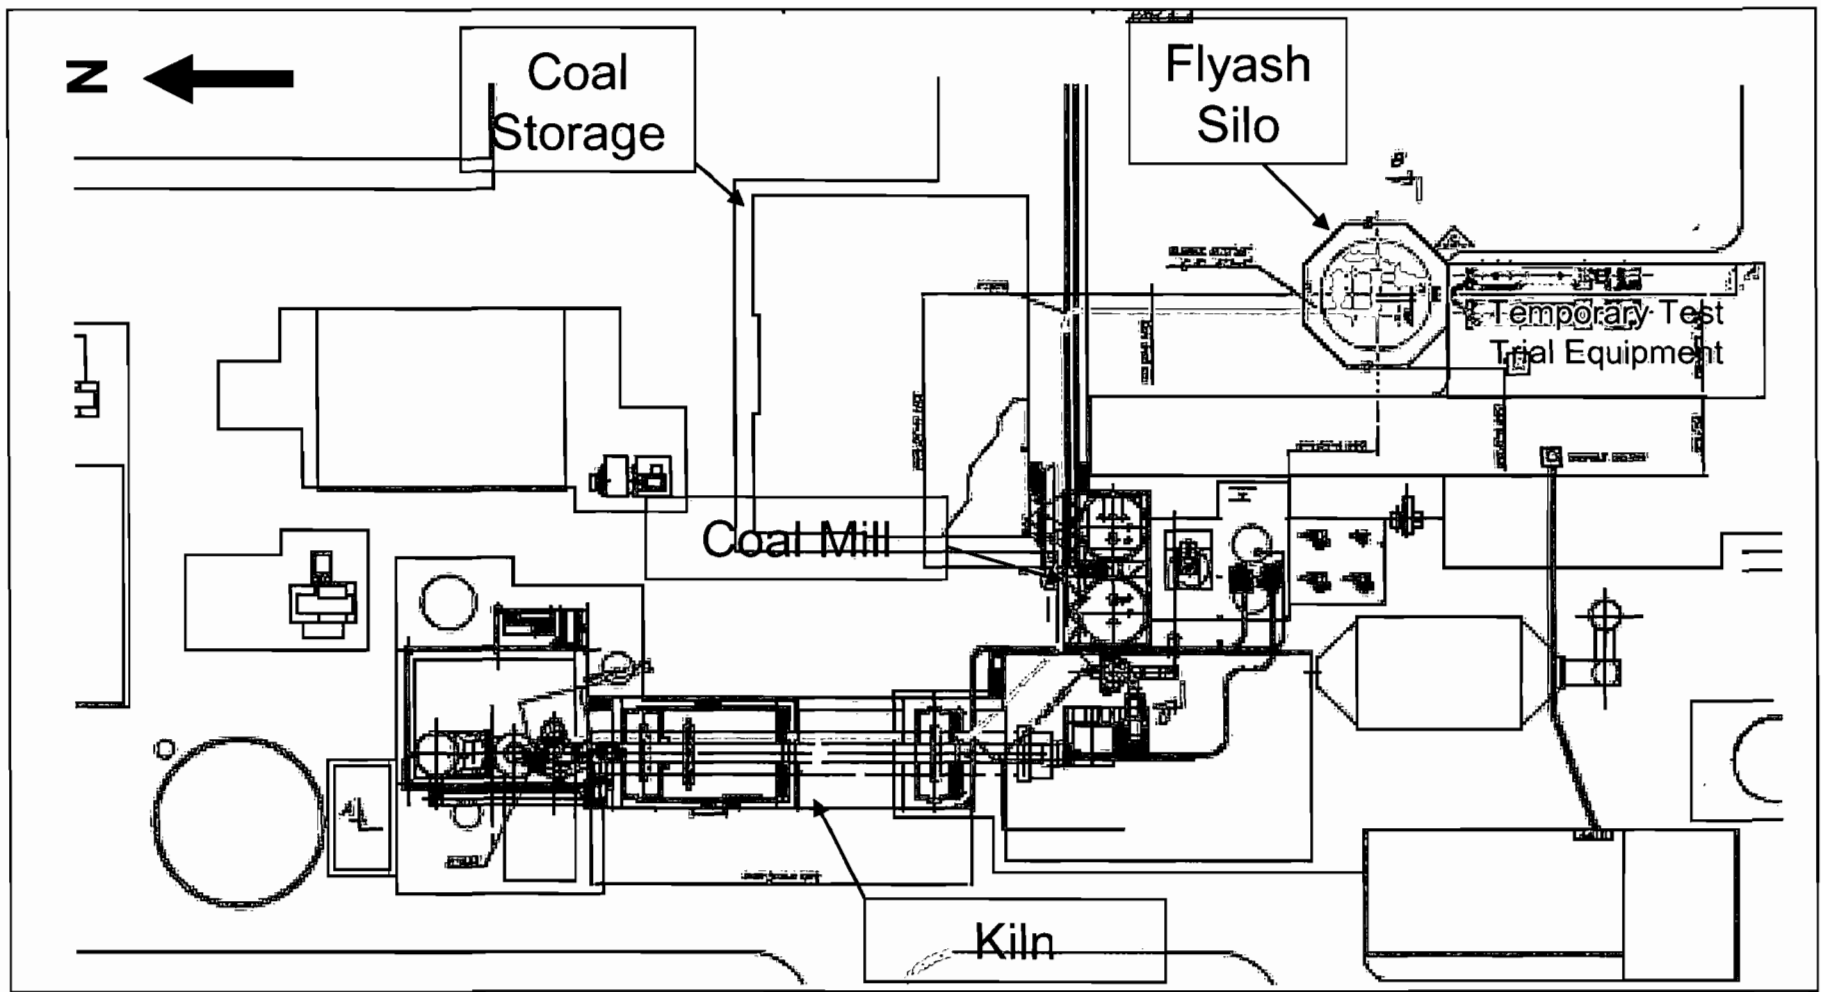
Overview layout of SAC facility and proposed location of test trial equipment.
